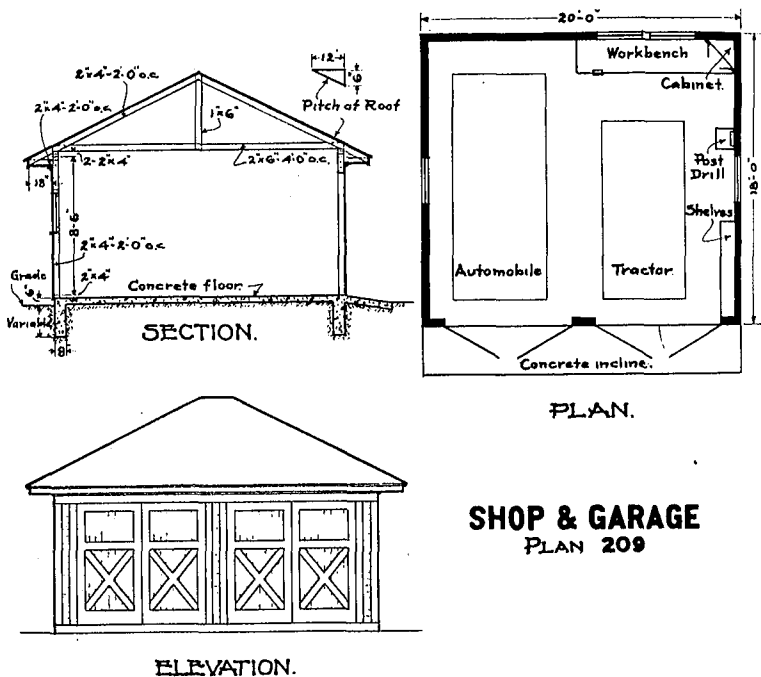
Shop and Garage 18×20 Feet. Plan 209
